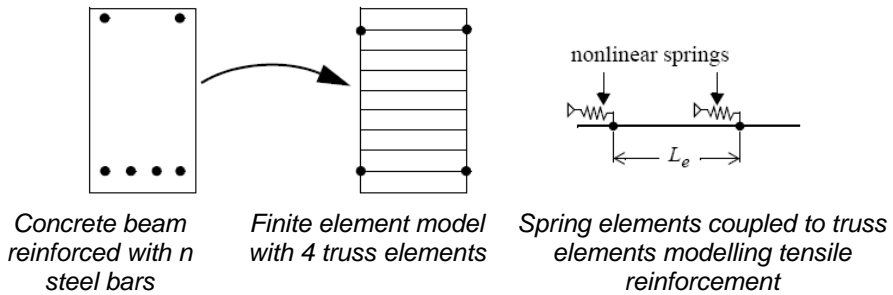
Finite element modelling of tensile reinforcement in concrete beams, Sand (2001).
